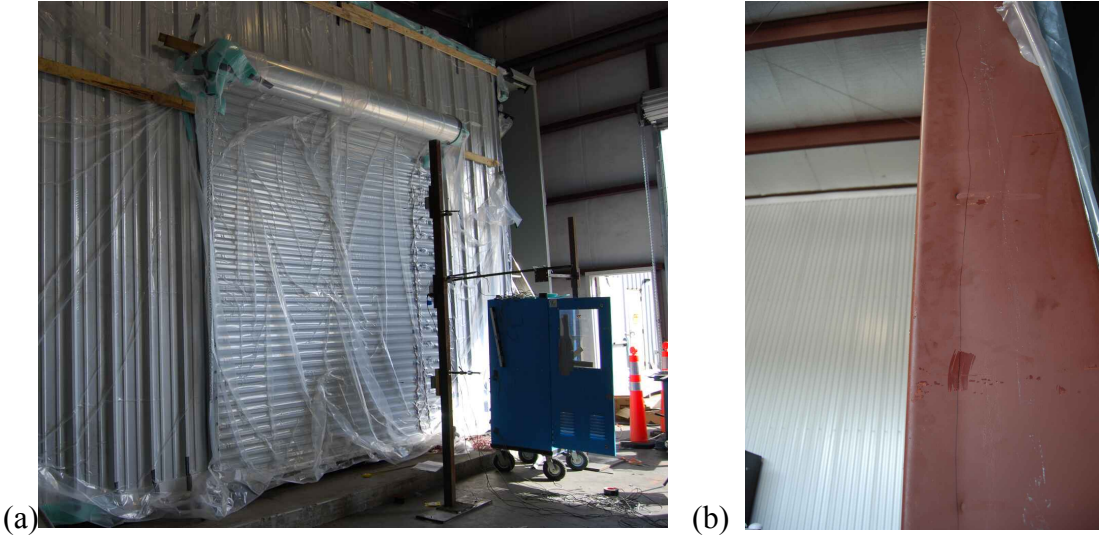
(a) Rolling sheet metal door experiment, (b) Deformed jamb after test (Gao and Moen 2009)
